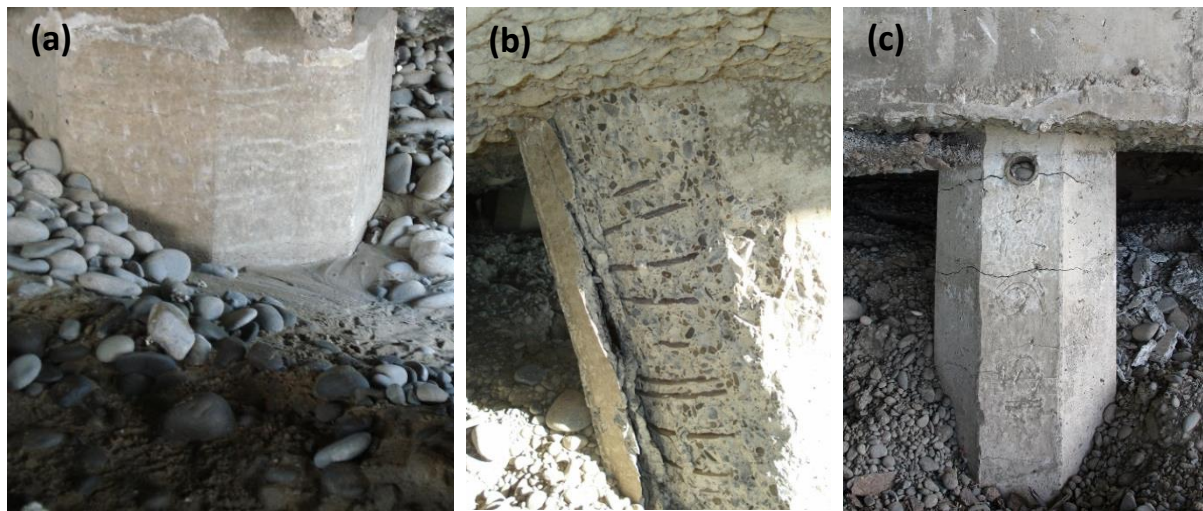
South Brighton Bridge observed pile damages, (a) flow of liquefaction sand ejecta around pile, (b) concrete spalling and exposure of transverse reinforcing, (c) flexural cracking in the river-facing side.
